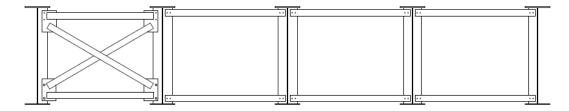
Lean-on Cross Frame Bracing
